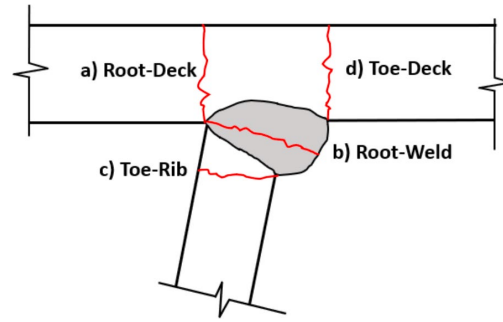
Types of potential fatigue cracks in rib-deck welds of OSDs.
